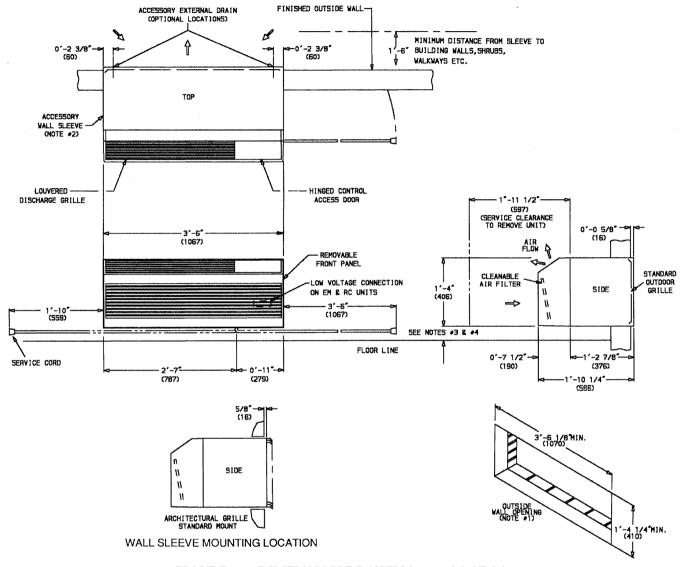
DIMENSION DRAWING — 52SC, SE, SQ
